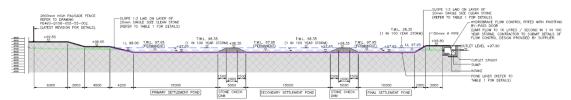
Permanent Settlement Pond Water Level and Settlement Pond Layout
